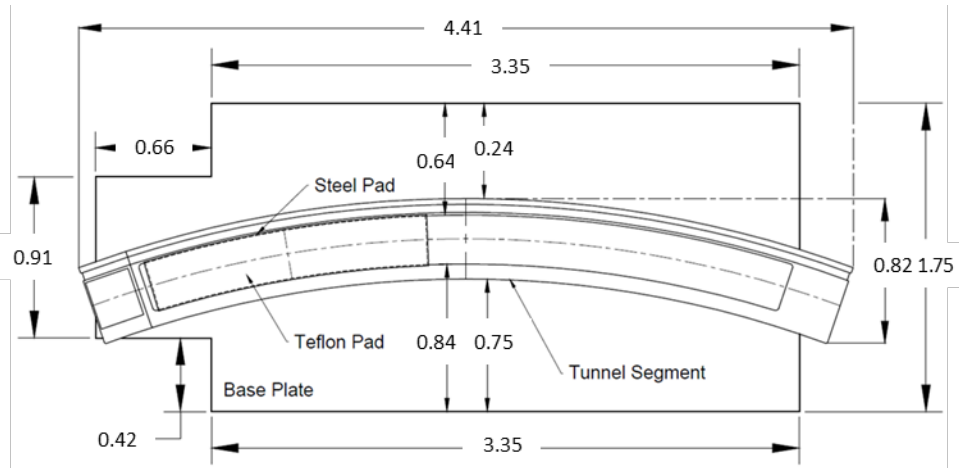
Plan view of load pad location at top and bottom of segment (dimensions in m).
